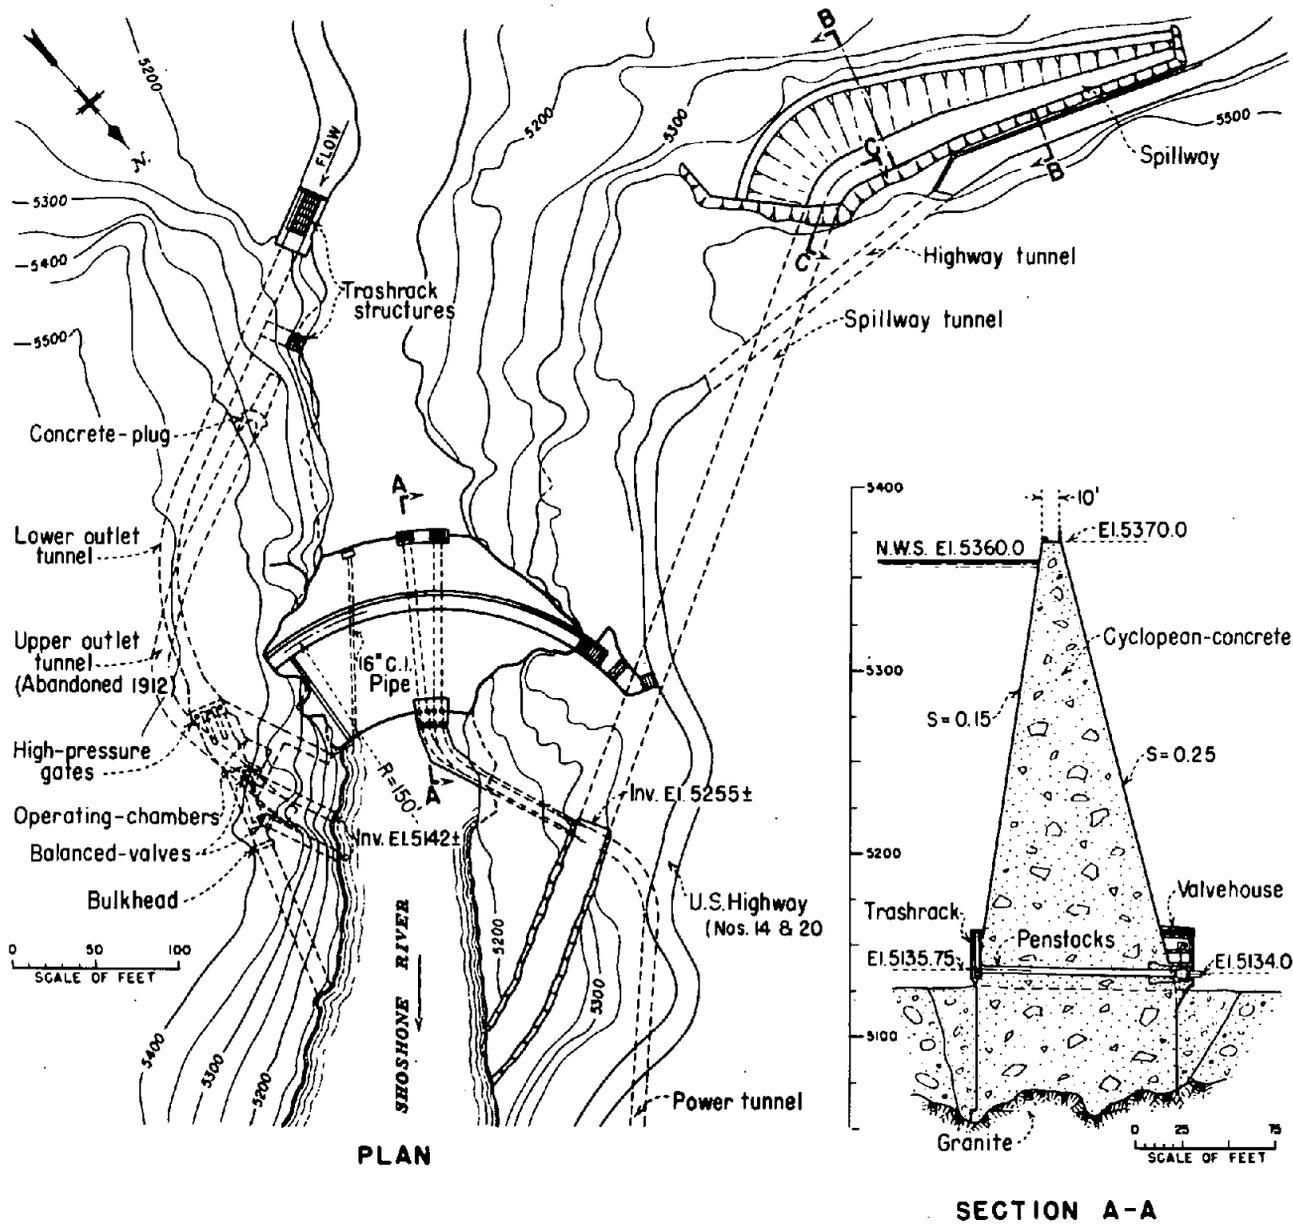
Existing hydraulic structures at Buffalo Bill Dam.
